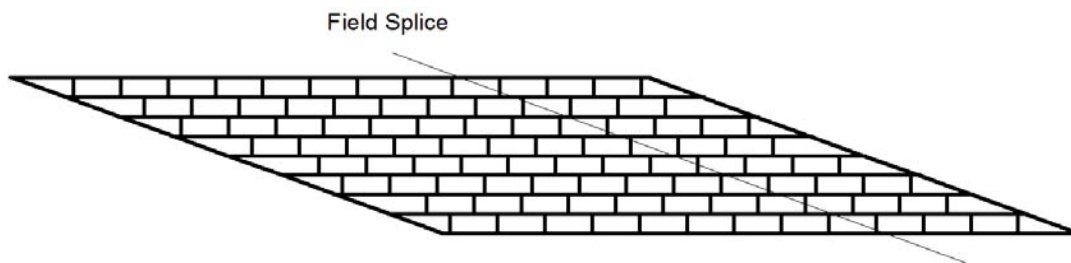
Critical erection stage of Bridge (J1) NISSS54 for TDLF detailing (the cross-frame connection with the largest fit-up force is the last connection installed in this bridge).
